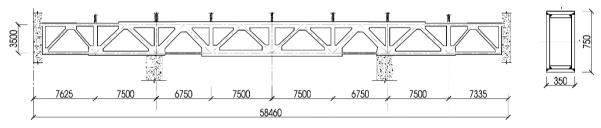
The solution truss with box-bar: a) Diagram of truss; b) Cross section of typical bars.
